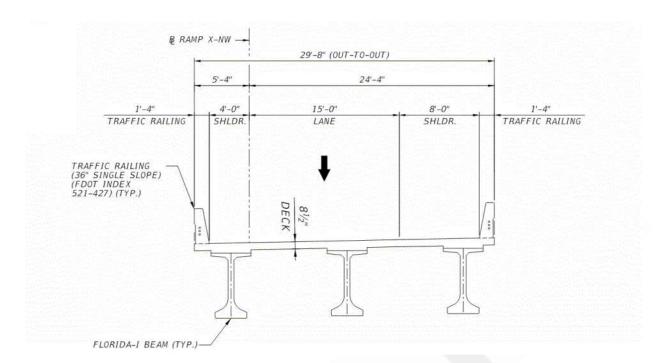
Bridge Typical Section (Bridge No. 5)
